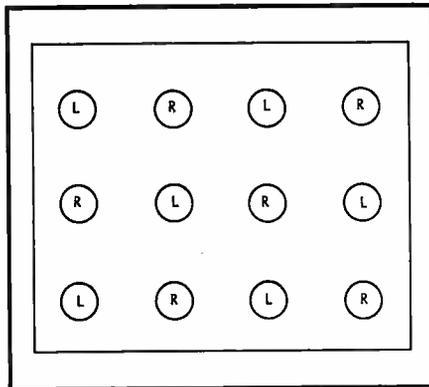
Ceiling plan for connections to get a form of stereo in a large, spread-out floor arrangement with low ceiling, such as a restaurant.
